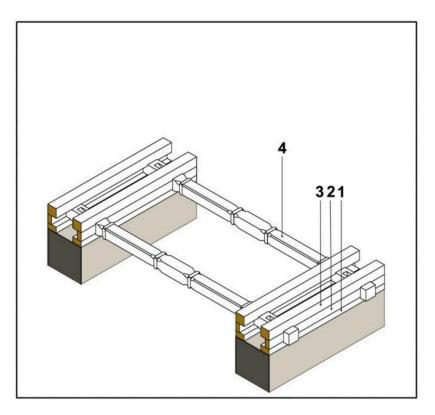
Wall-plates are placed along the north and south walls (1). On these, and at distances of around 2 meters, tie-beams with specially shaped edges (4) are connected. Between tie beams, planks in an upright position (2) are locked. Two square-shaped members (3) complete the composite "box-like" beams on the long walls, locking within their structure the edges of the transverse tie-beams (M. Pelekanos) [13].
